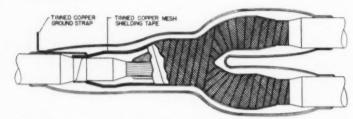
"Y" joint for single-conductor, rubber-insulated, shielded, non-metallic-sheathed cables.
